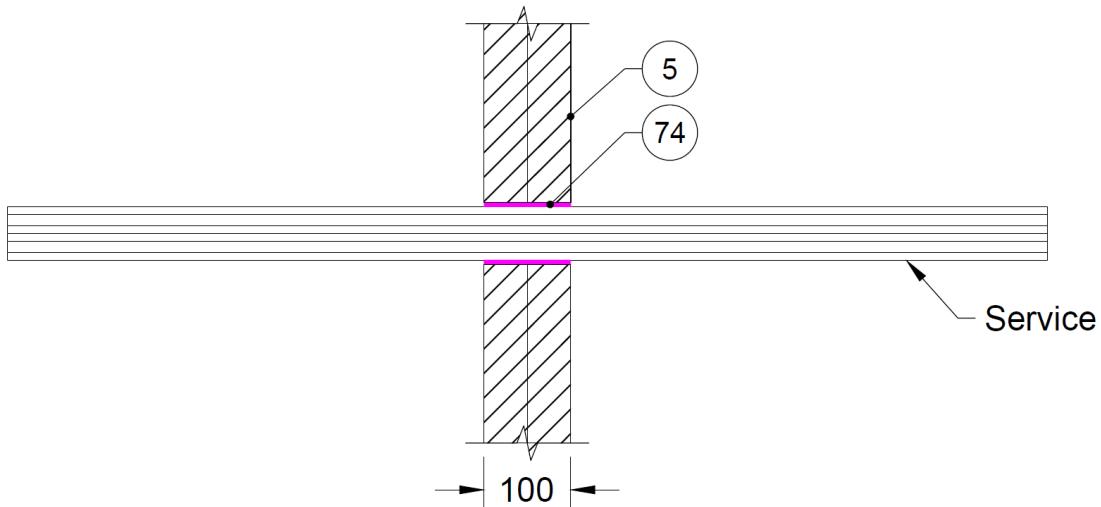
Section View of lagged copper Pipe Installed in Vertical Substrates
